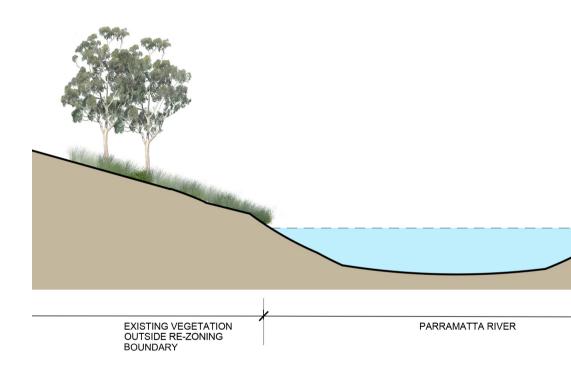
Site Section B'Riverbank Lawn' 1: 250 @ A3
